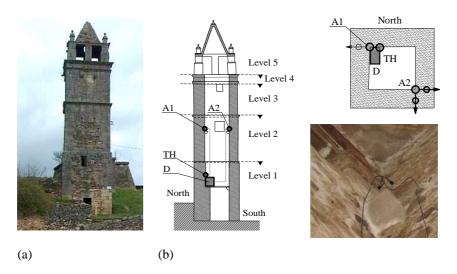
Mogadouro Clock tower: (a) view of the structure; (b) SHM sensors deployment.
